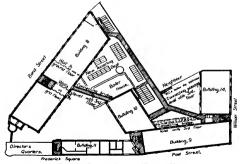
PLAN OF REBUILT WEAVING MILL
